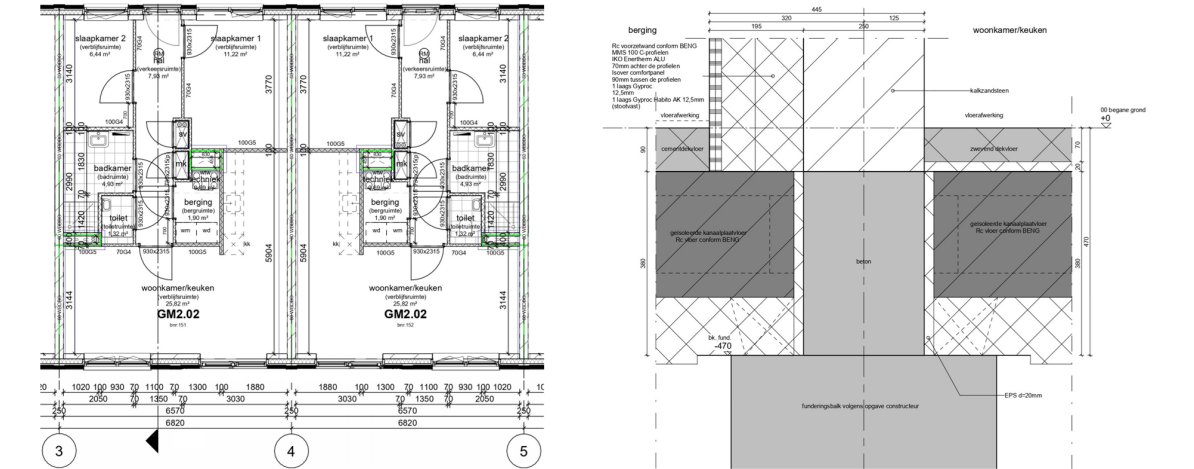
Architectural layout of the apartments (left) and detail of the connection between the load-bearing walls and the foundation (right) (Venster Architecten, 2024).
